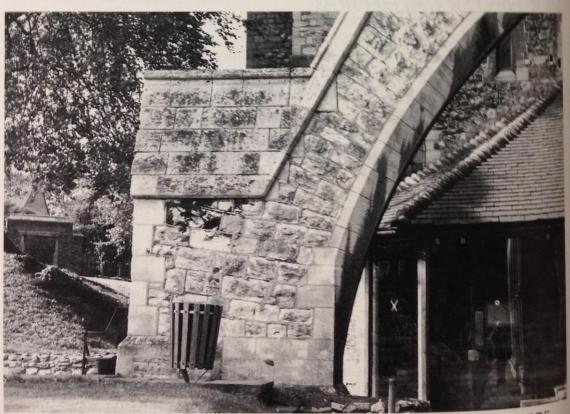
Plate II. Flying buttress to wall of south choir aisle, by Gilbert Scott, 1875. Kenish Rag with dressings of Chilmark stone.
